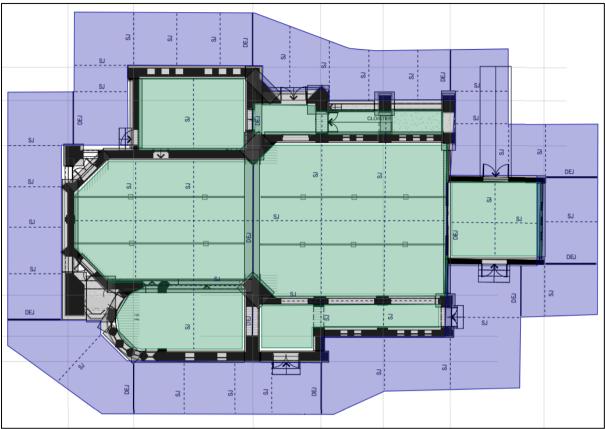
Apron slab around the exterior of the church (purple) is to be constructed to shed rain water and minimise future movement of the church.
